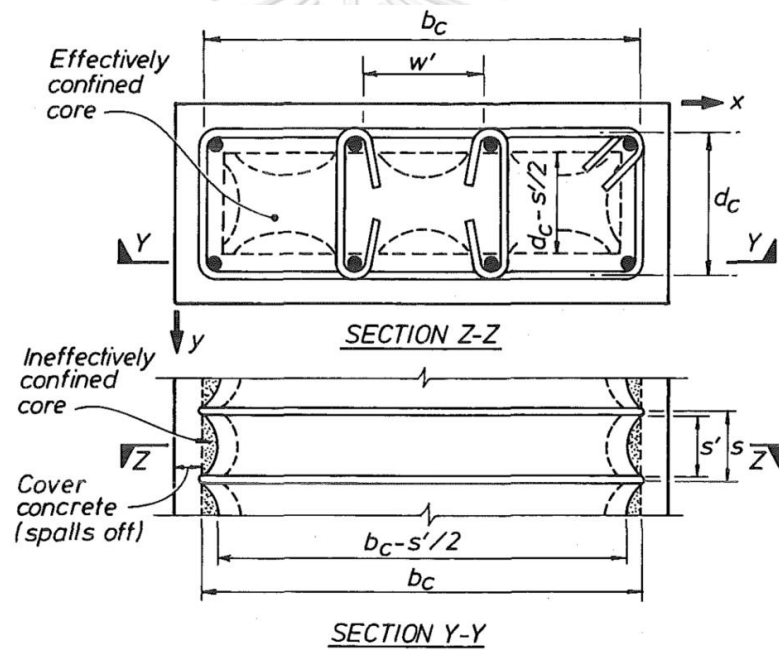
Area of confined concrete by rectangular hoop stirrups (Mander et al., 1988).
